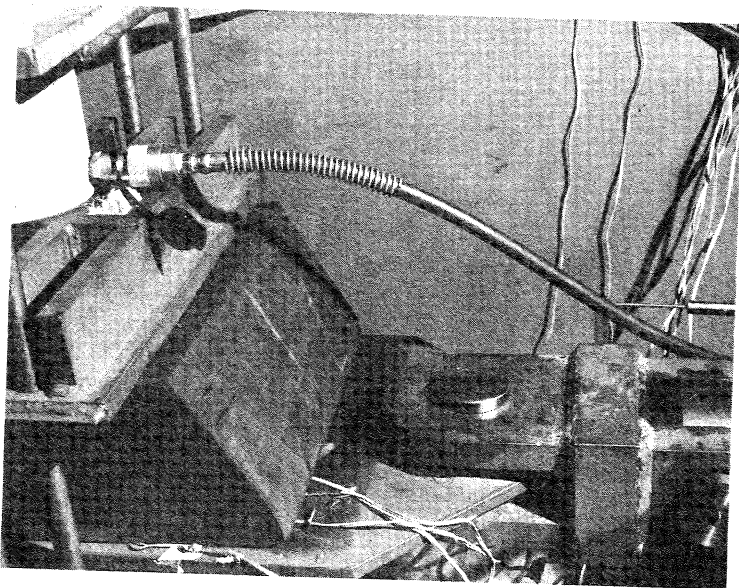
SLIPPING OF BEARINGS FROM 130% SHEAR
